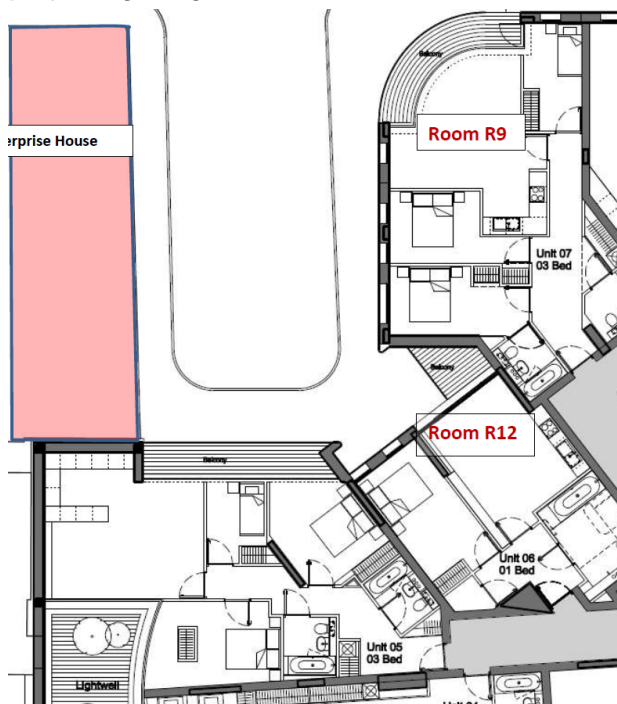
Typical lower floor layout facing site in Goldpence Apartments
